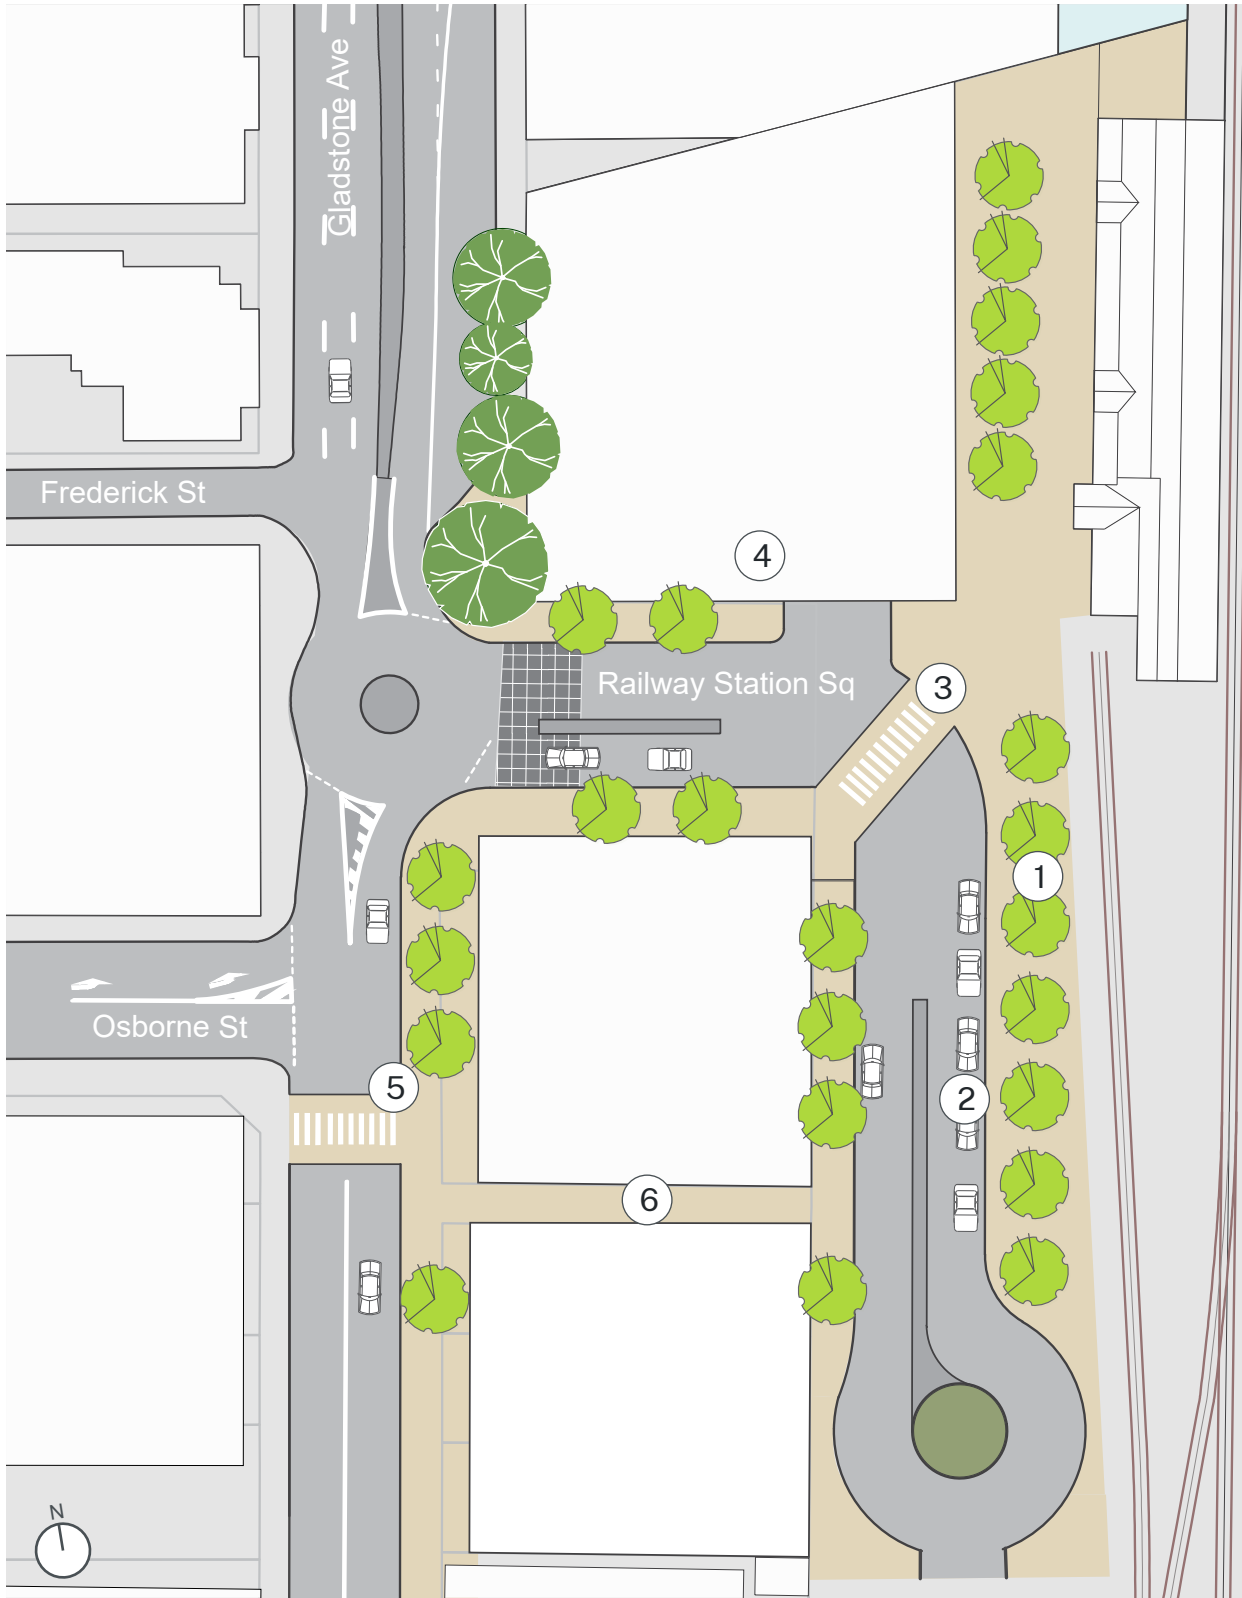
Indicative plan of proposed changes to western gateway (short term)
